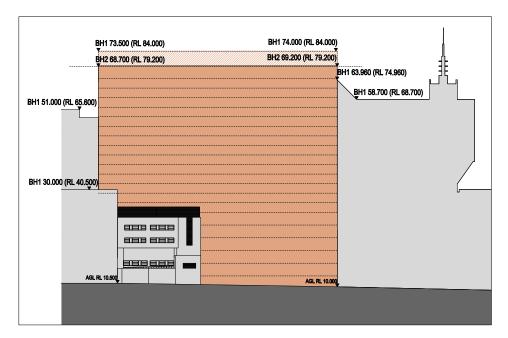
Building 6 in relation to adjoining buildings - UPN elevation (Source: BVN)
